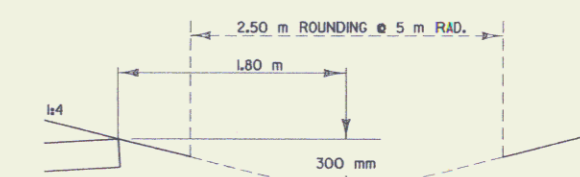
DETAILS OF DITCH AND BACKSLOPE FOR LOW SIDE OF BANK ≥ 0.042
